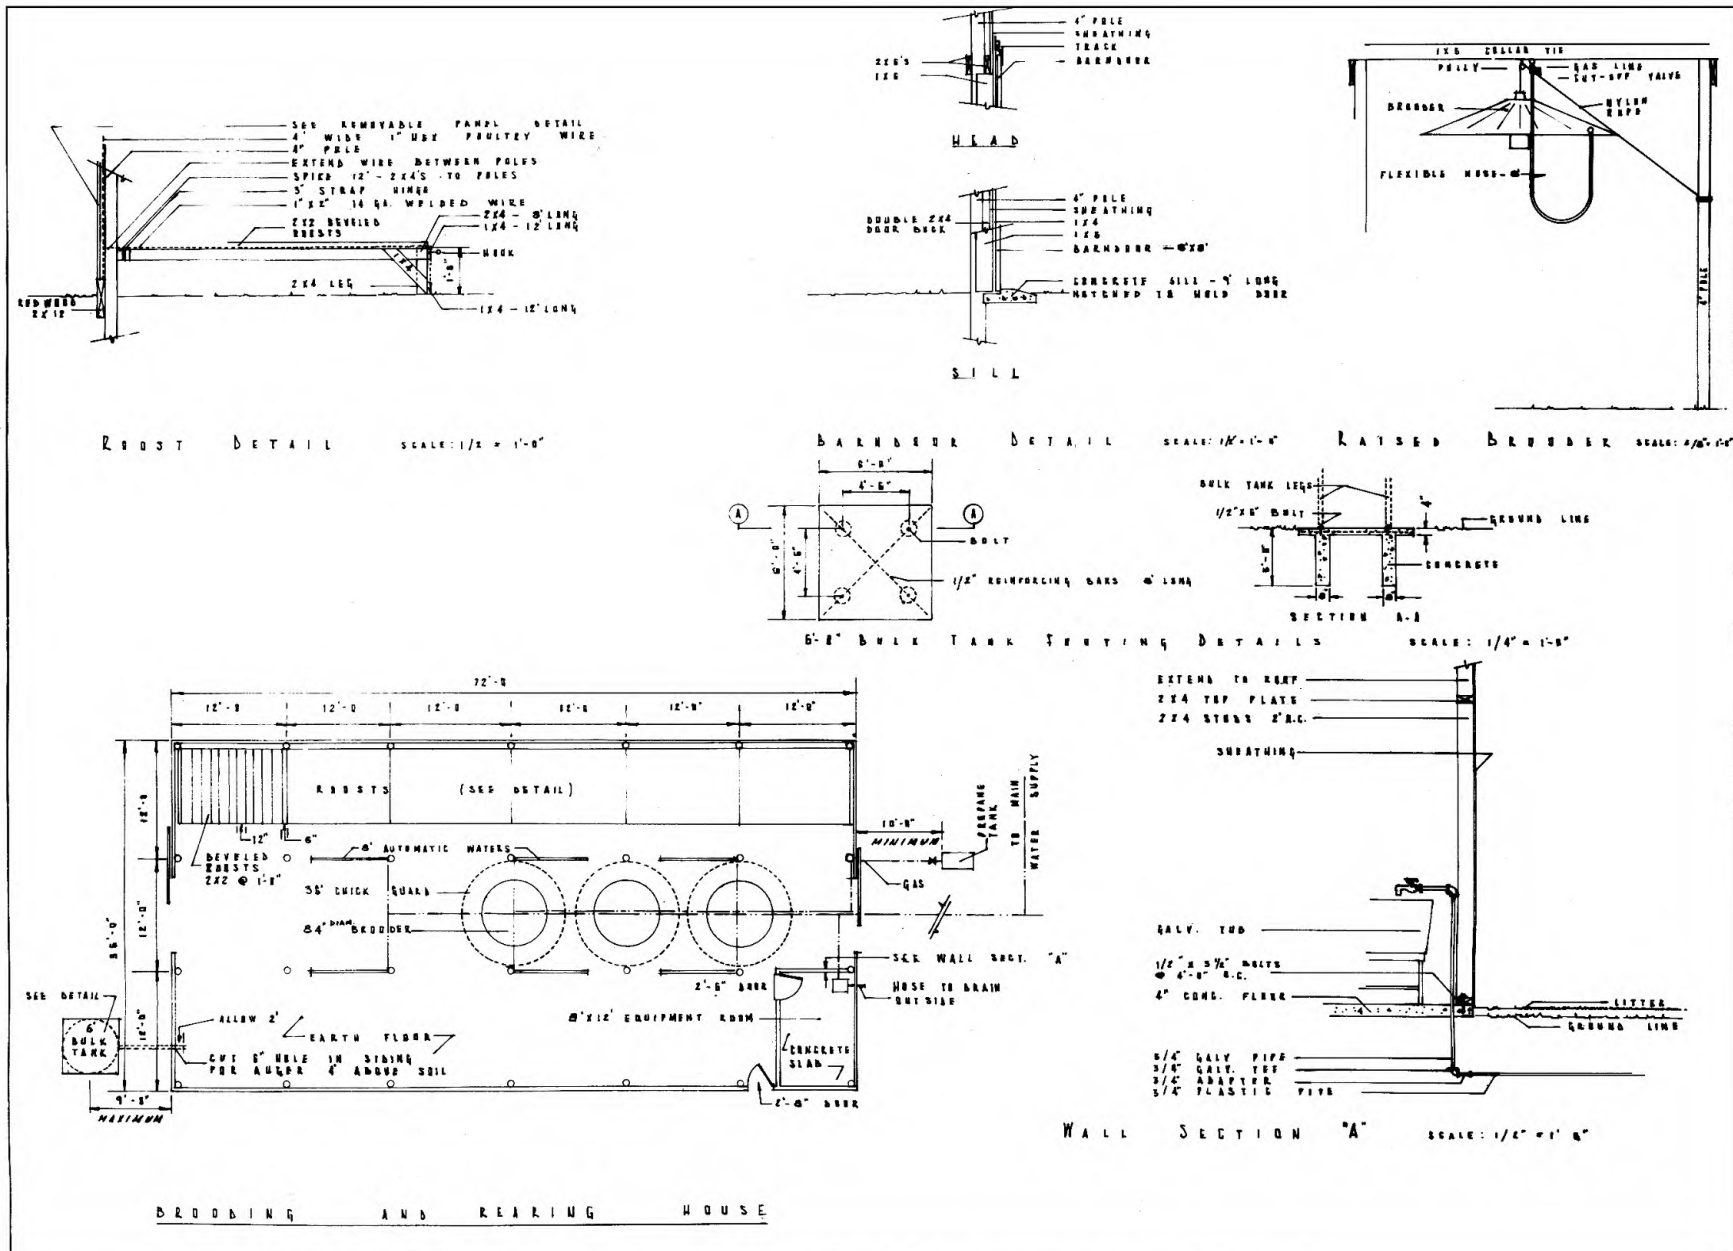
Plans for the 36' x 72' Kansas pole-type poultry houses and equipment.
